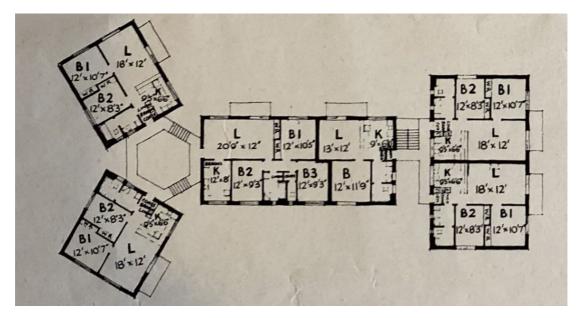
Floor plan layout of the six flats in each cluster of the first stage of Hotham Gardens Source: *Cross-Section*, University of Melbourne Department of Architecture, No. 100, 1 February 1961, p. 3.
